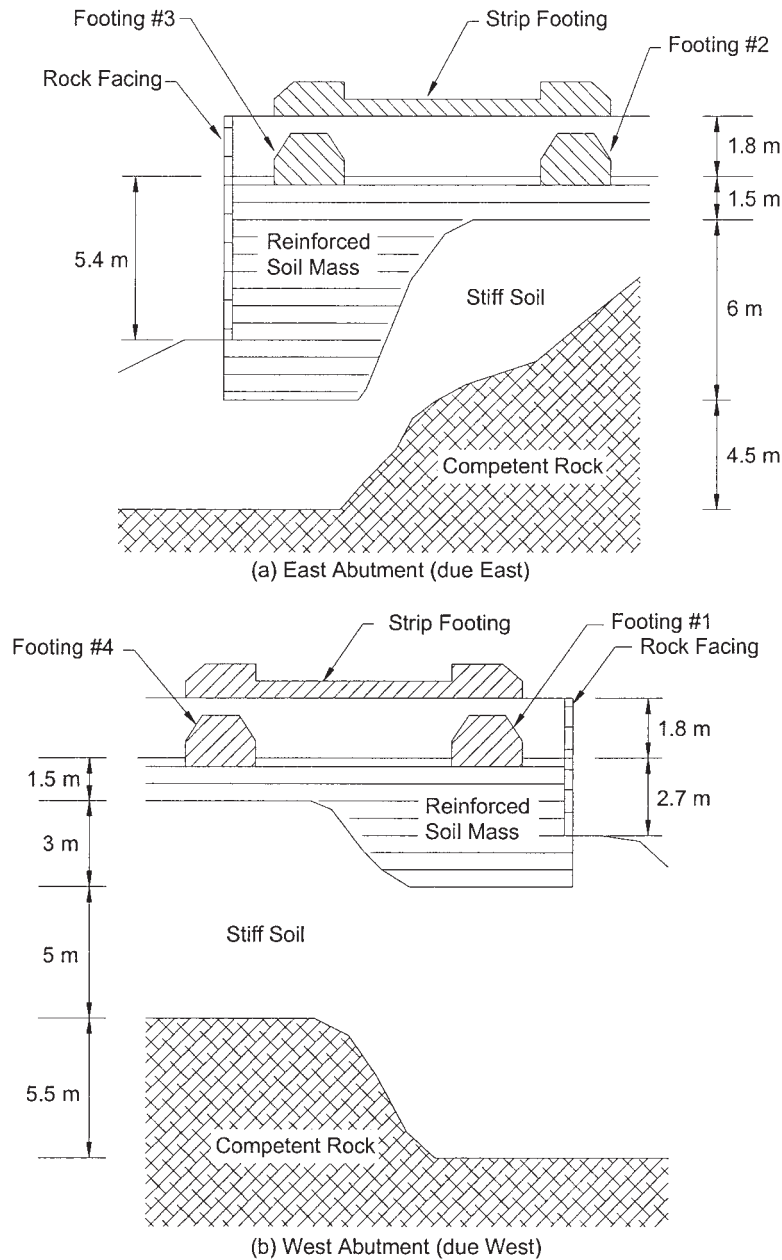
Footings and foundations of the Black Hawk bridge abutments (Wu et al., 2001).
